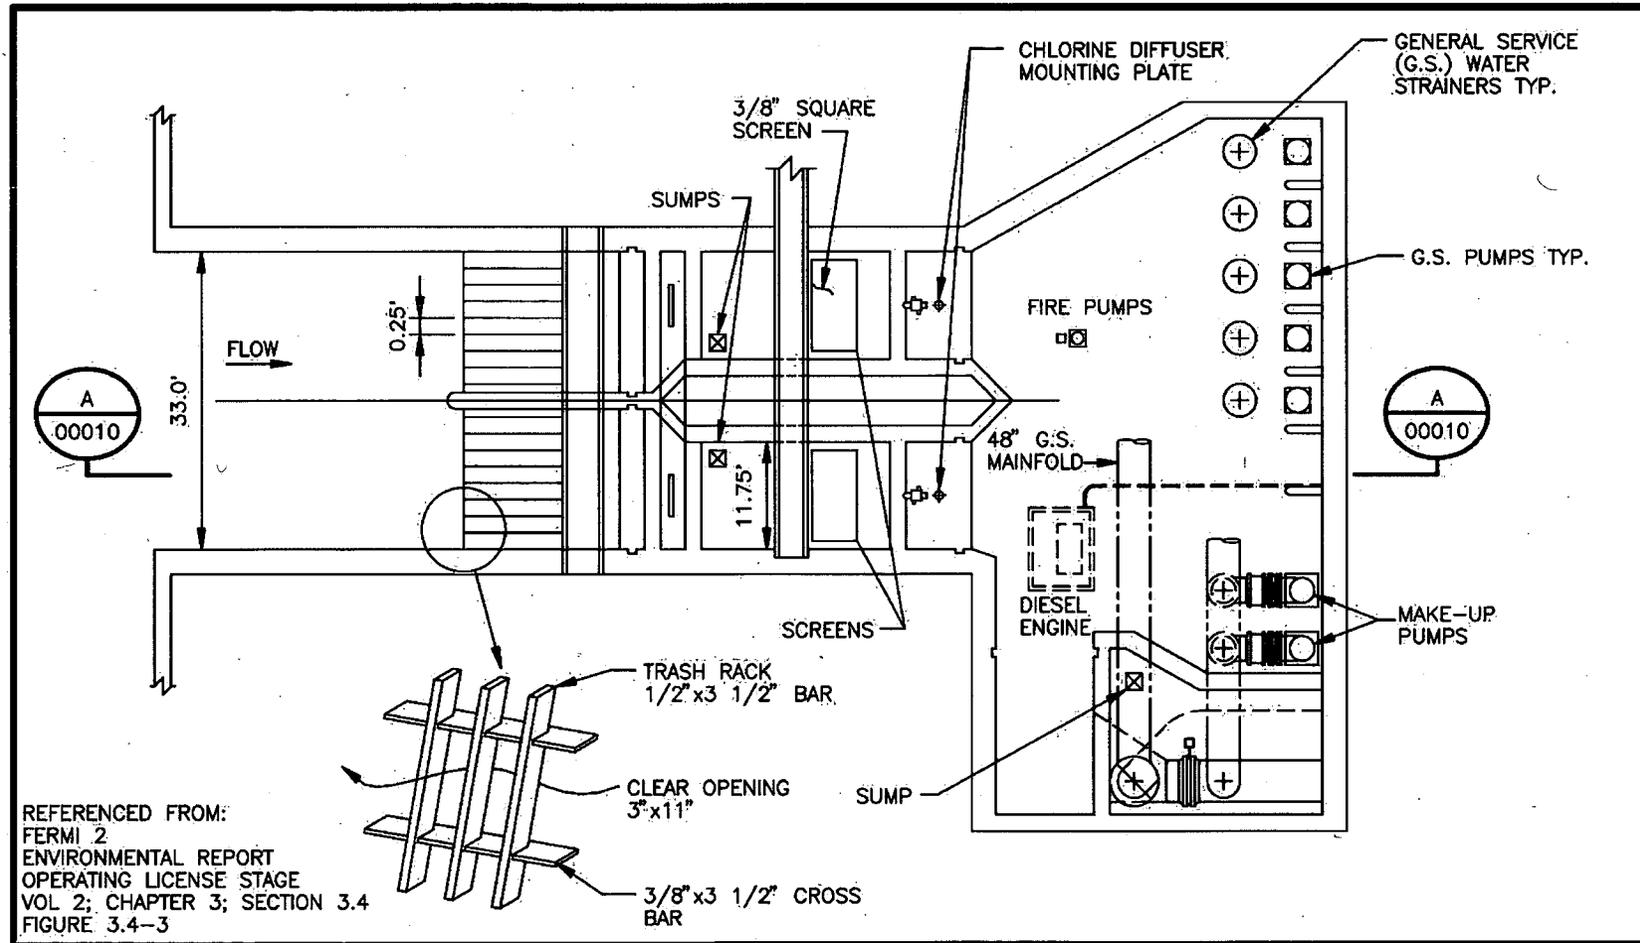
Fermi 2 General Service Water System Intake Structure – Cross Section
